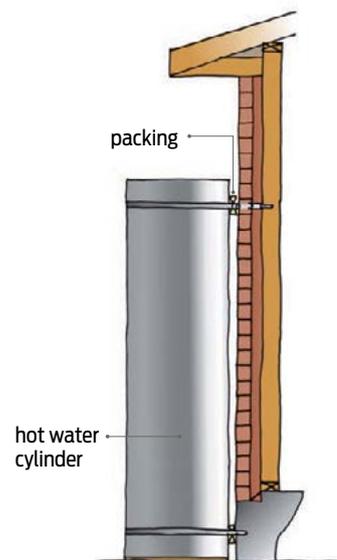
Anchor an exterior hot water cylinder to wall framing THROUGH a veneer. Do not fix to the veneer.
